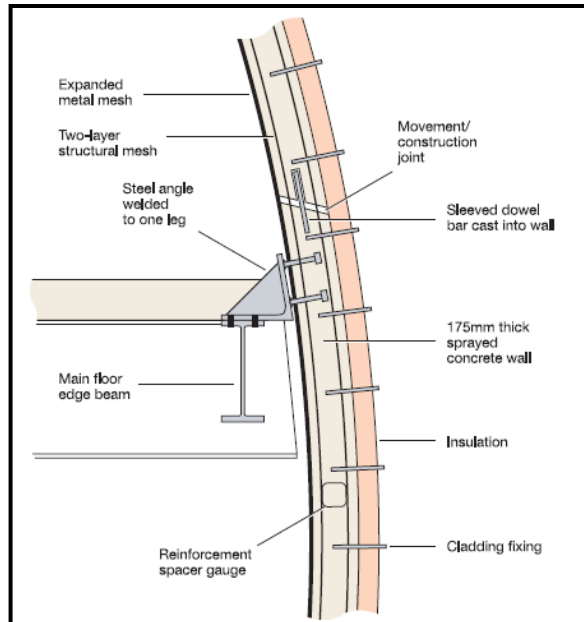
Indicative section through sprayed concrete wall, showing fixing detail, (The Arup Journal 2005).
